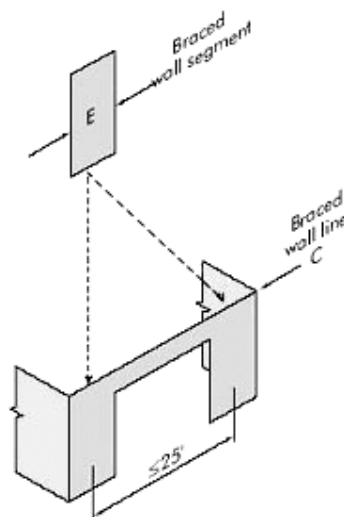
Braced wall panel and braced wall line (Source: <http://www.apawood.org>)
